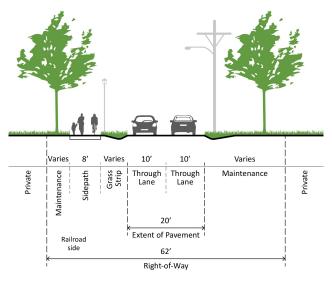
Proposed Typical Street Section for Barnesville Road from Clarksburg Road to the MARC Platform
